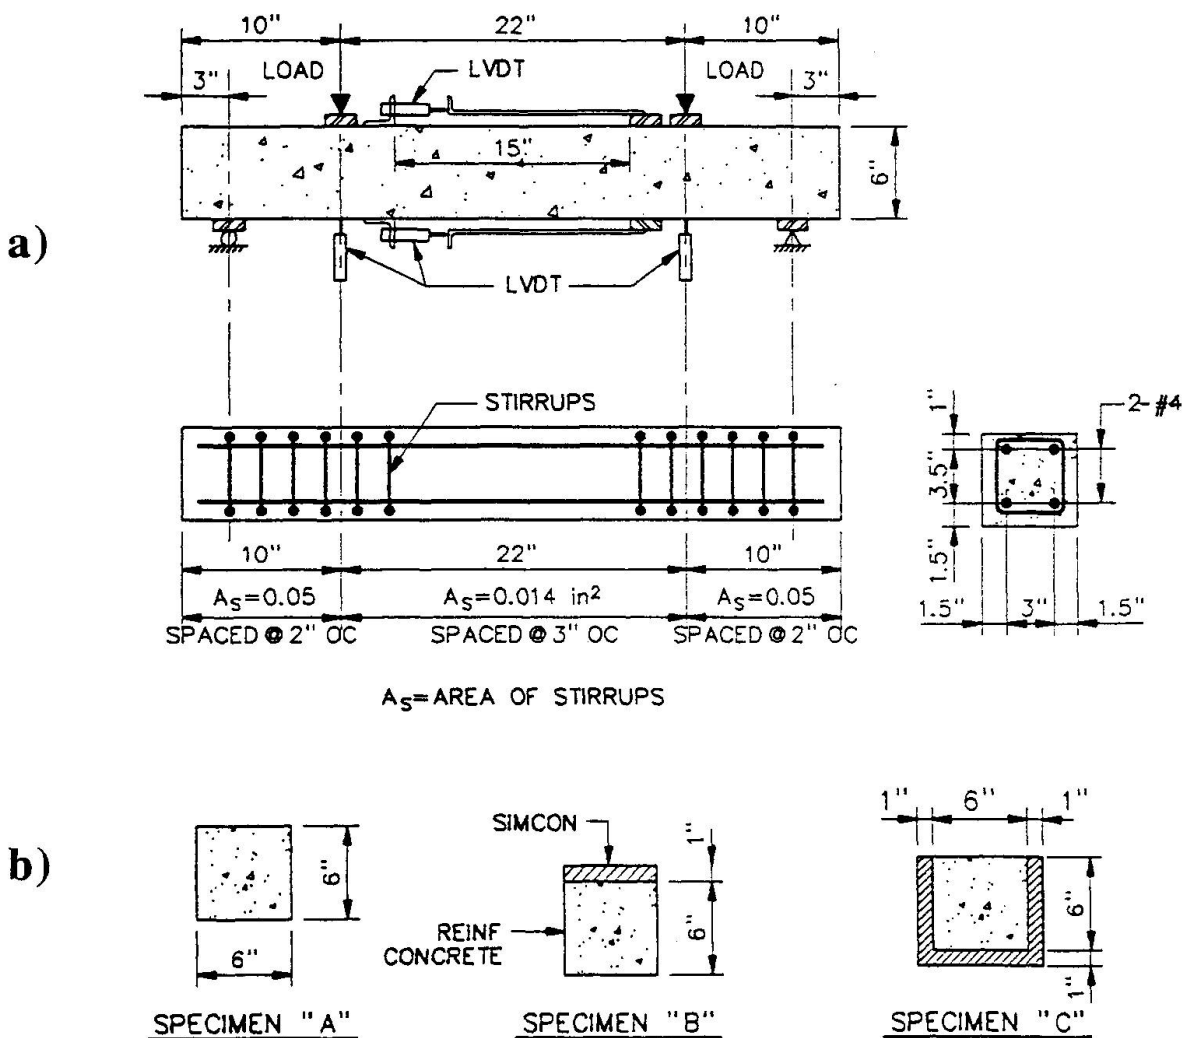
(a) Layout of the reinforced beam tested in this investigation. (b) SIMCON retrofit layouts.
